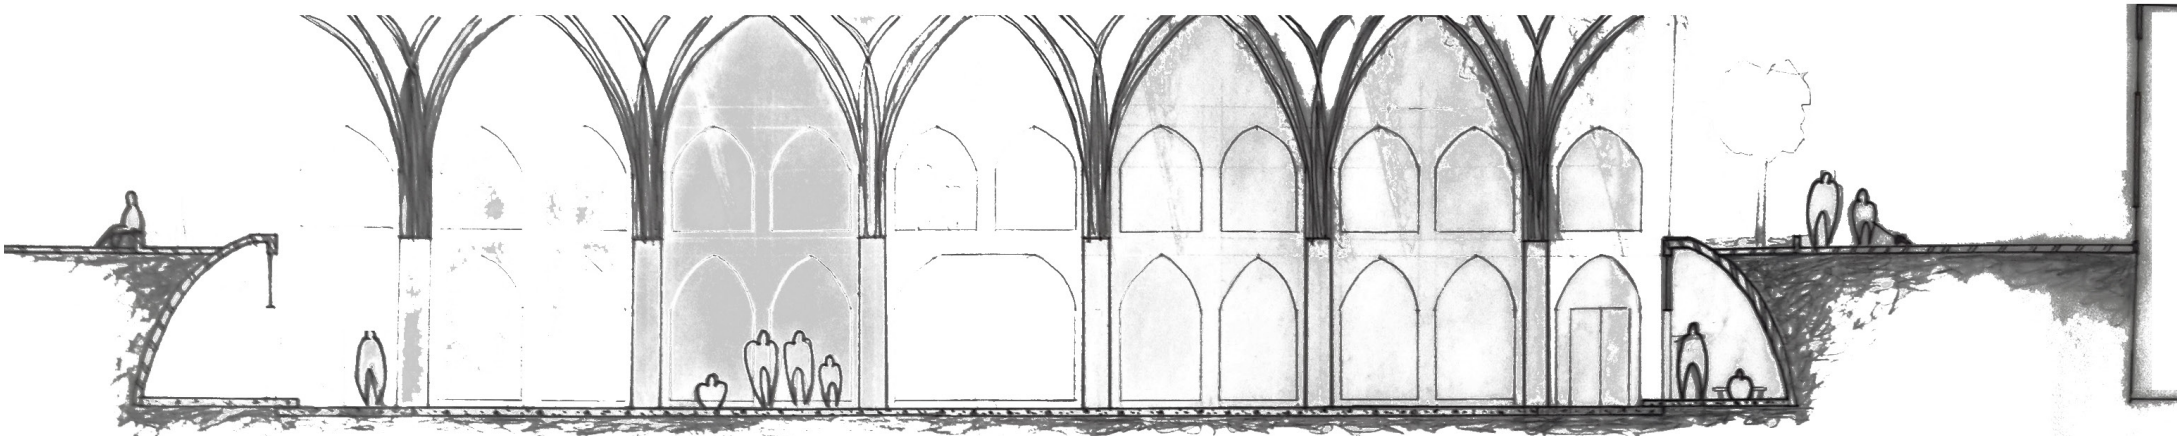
SECTION/ ELEVATION OF MOSQUE SPACE
